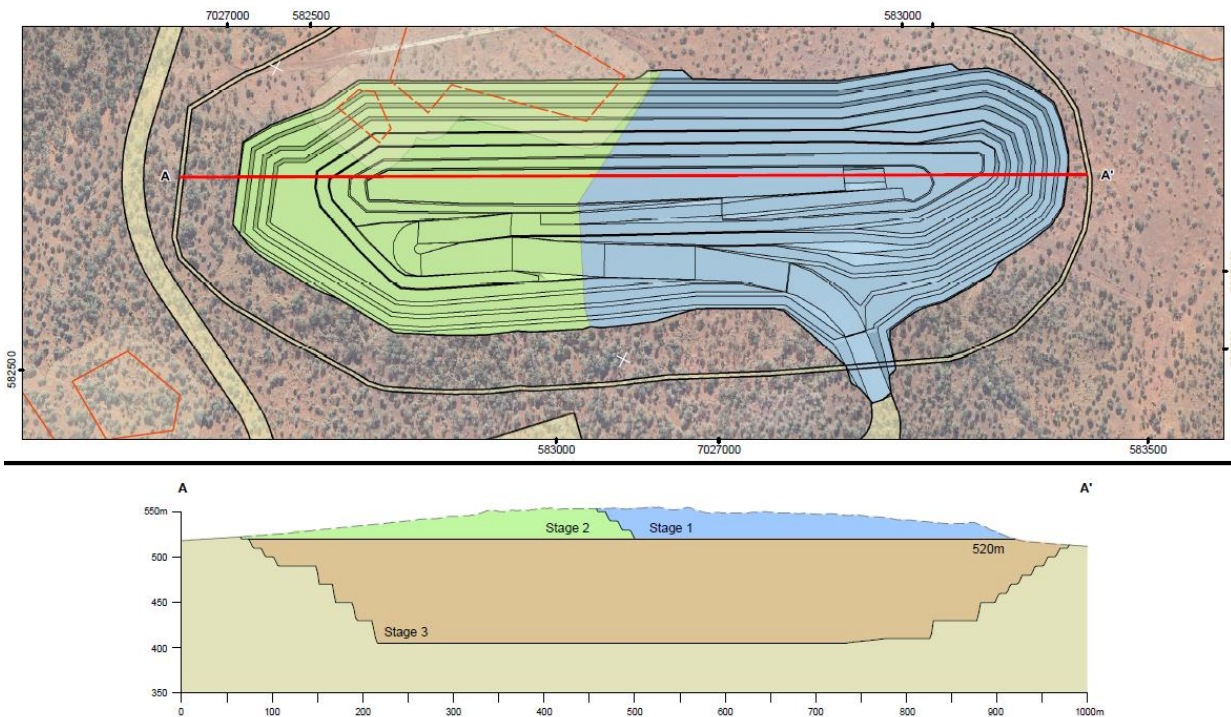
Beebyn-W11 Ultimate pit showing internal mining stages (cross-section)
